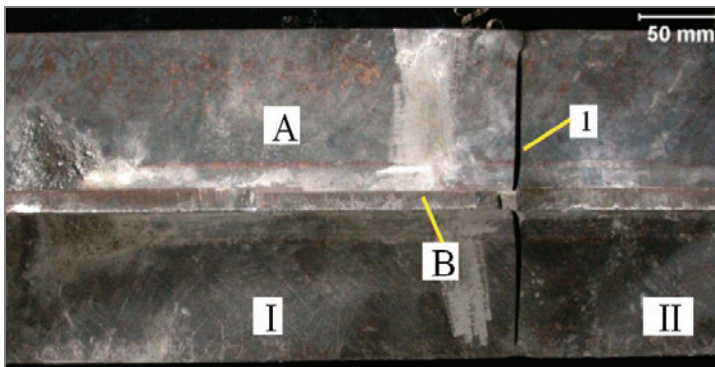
Macroscopic photo of the tested specimen. View from side. I – The left part of the cracked beam. II – The right part of the cracked beam. 1 – crack. A – Flange of steel section. B – Web of steel section
